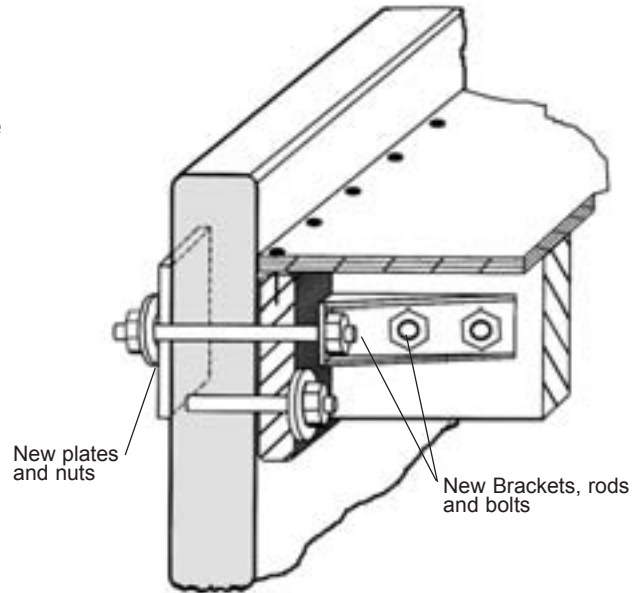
Strengthening Wall Anchors. One of several ways to strengthen the connections between the roof and floor joists and the walls is to install brackets and rods that go through the walls and attach to the joists.
